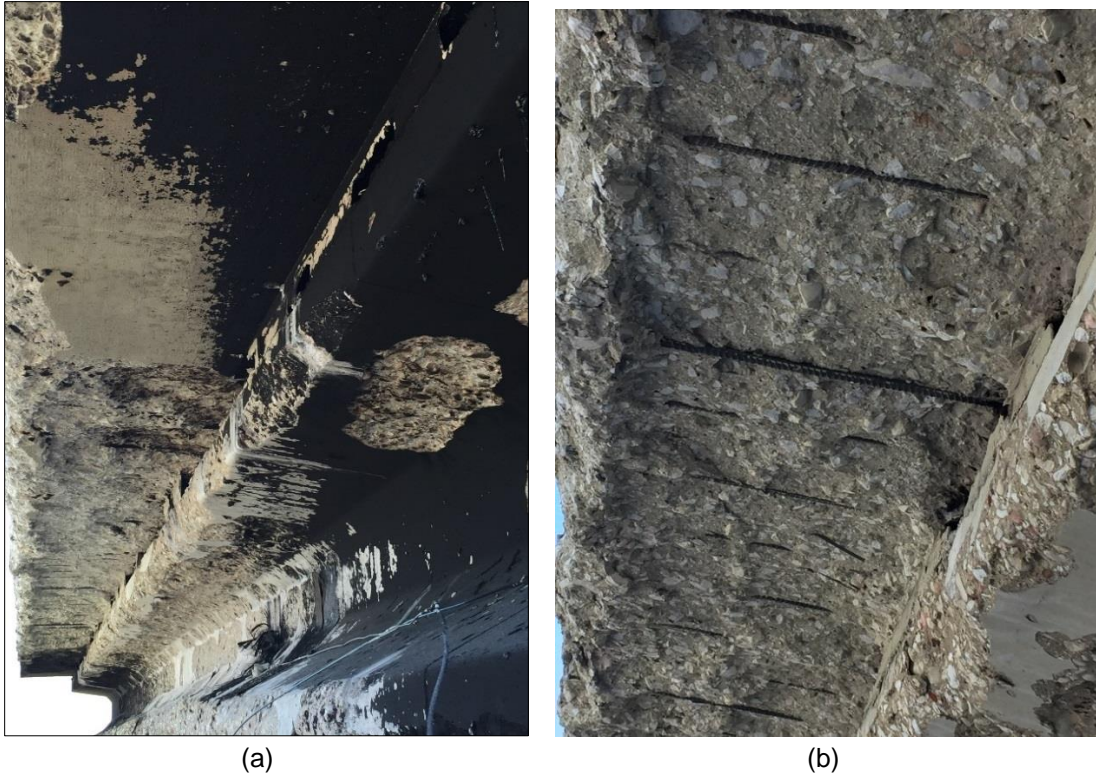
(a) Overhang portion of the deck on Girder-1 side after the fire; (b) closer look at of the spalled concrete for the overhang portion of the deck on Girder-1 side
